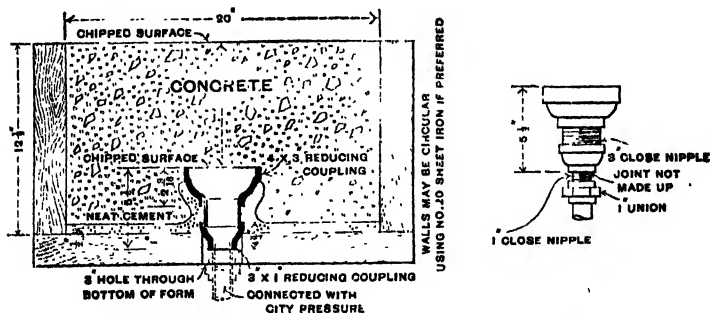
Detail of Specimen for Testing Permeability.\* (See p. 348.)
